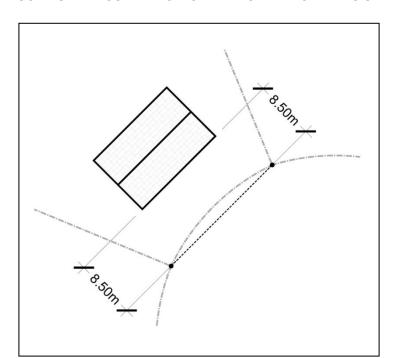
ILLUSTRATION OF PRINCIPAL BUILDING SITING
